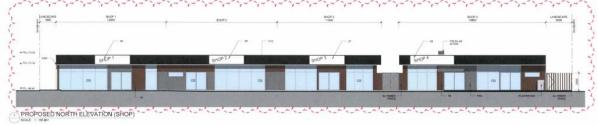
Elevation of Shops 1-4 at 85-89 Manifold Street, Camperdown
